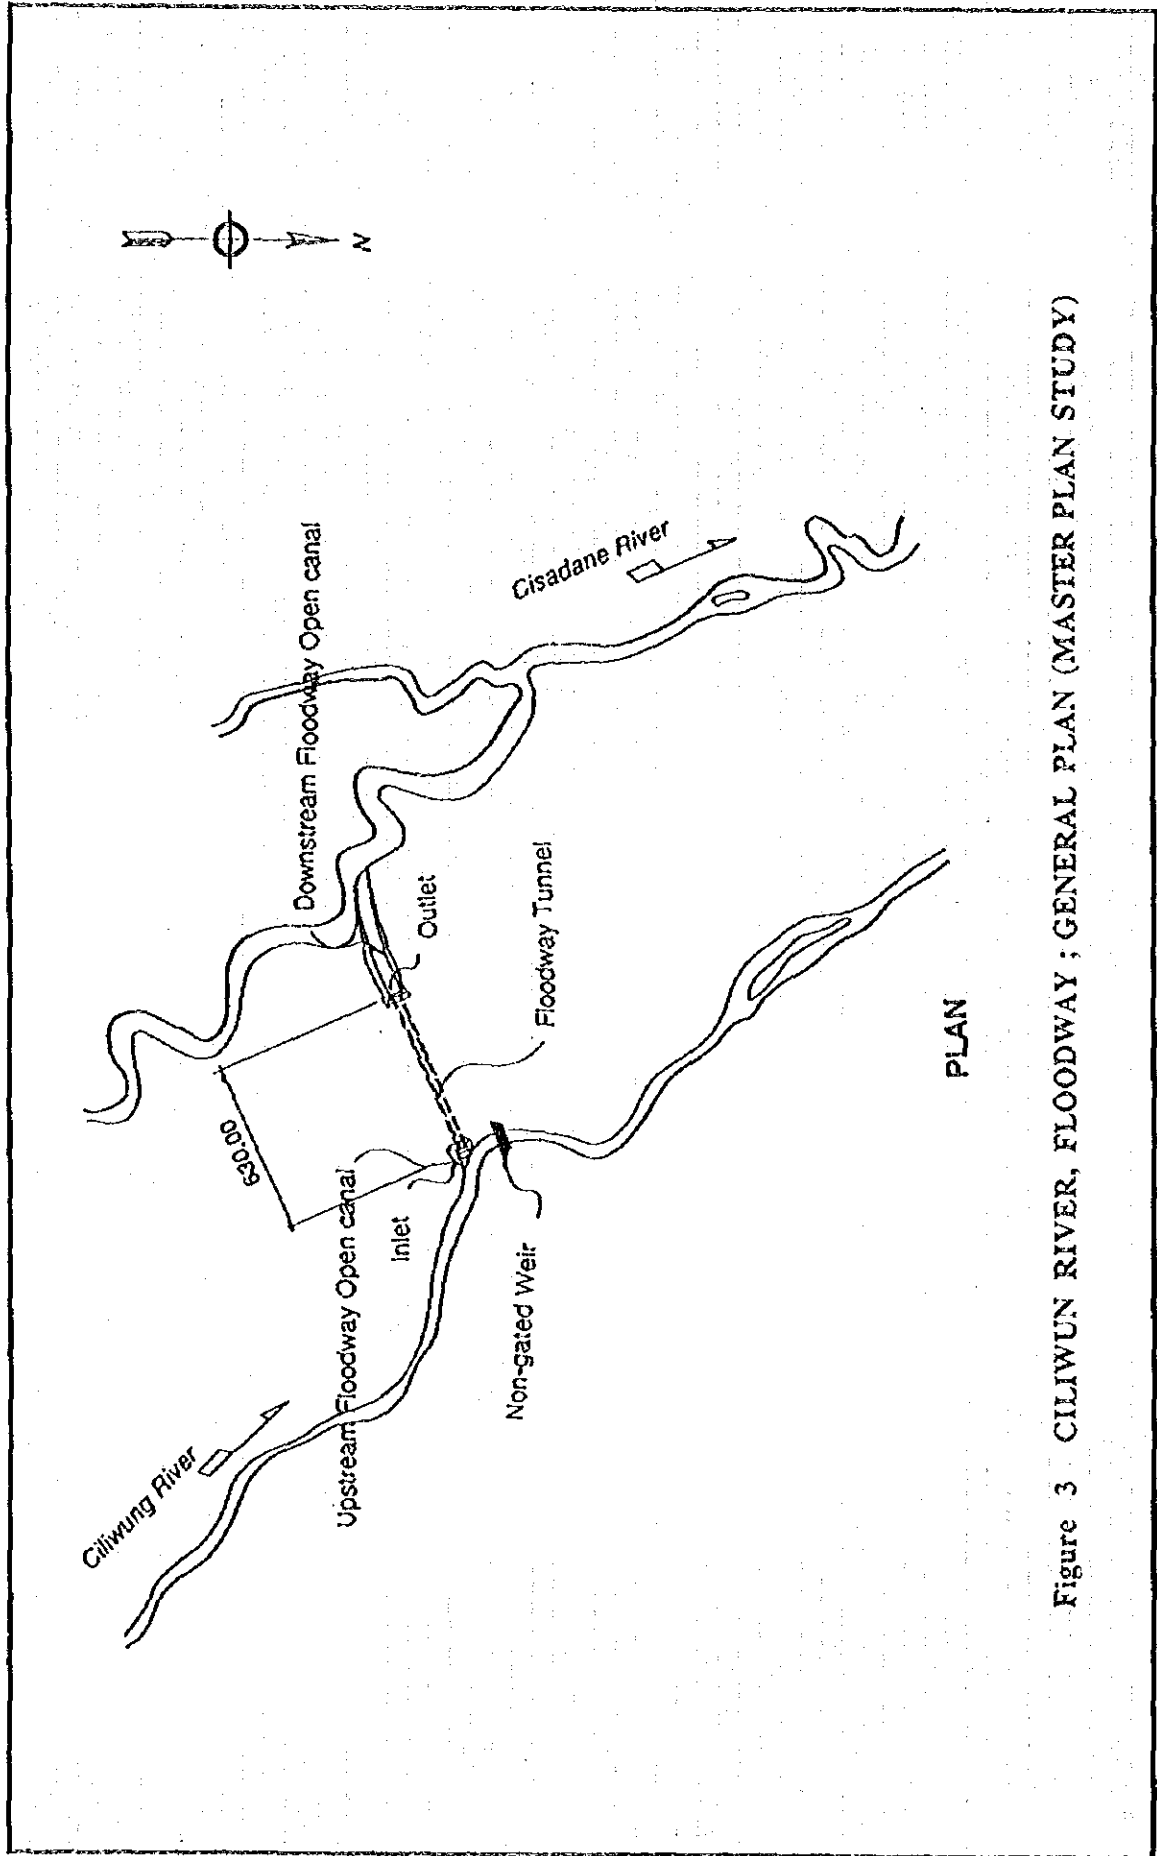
CILIWUN RIVER, FLOODWAY ; GENERAL PLAN (MASTER PLAN STUDY)
